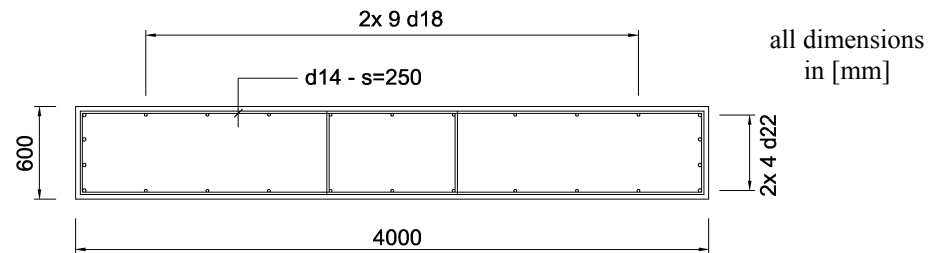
Cross-section of piers P1 and P5 of Viadukt Mühle Rickenbach in SG
